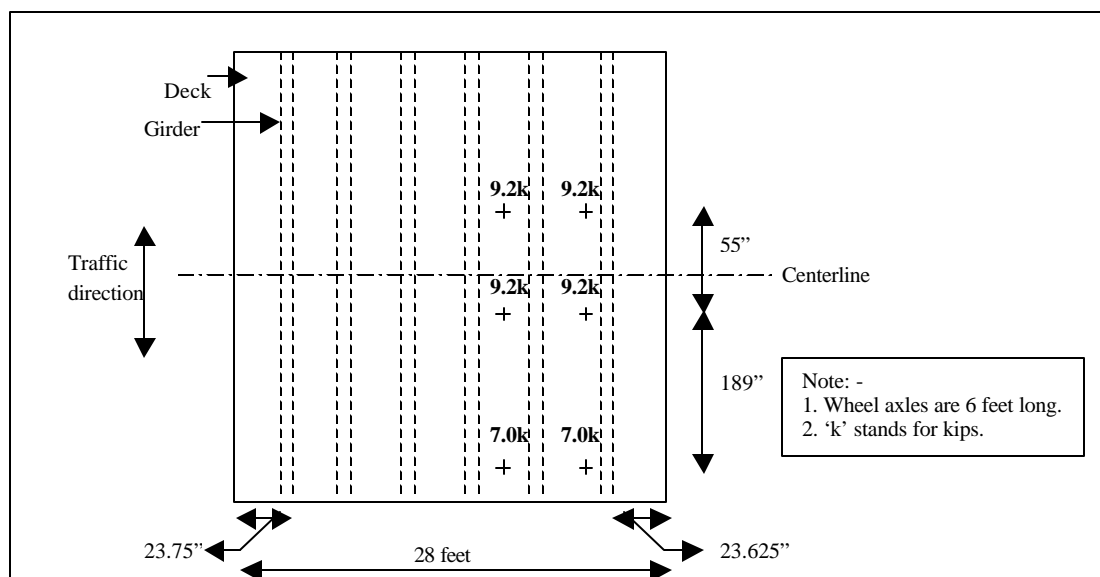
Plan layout of the Cow Gulch Bridge, Montana
